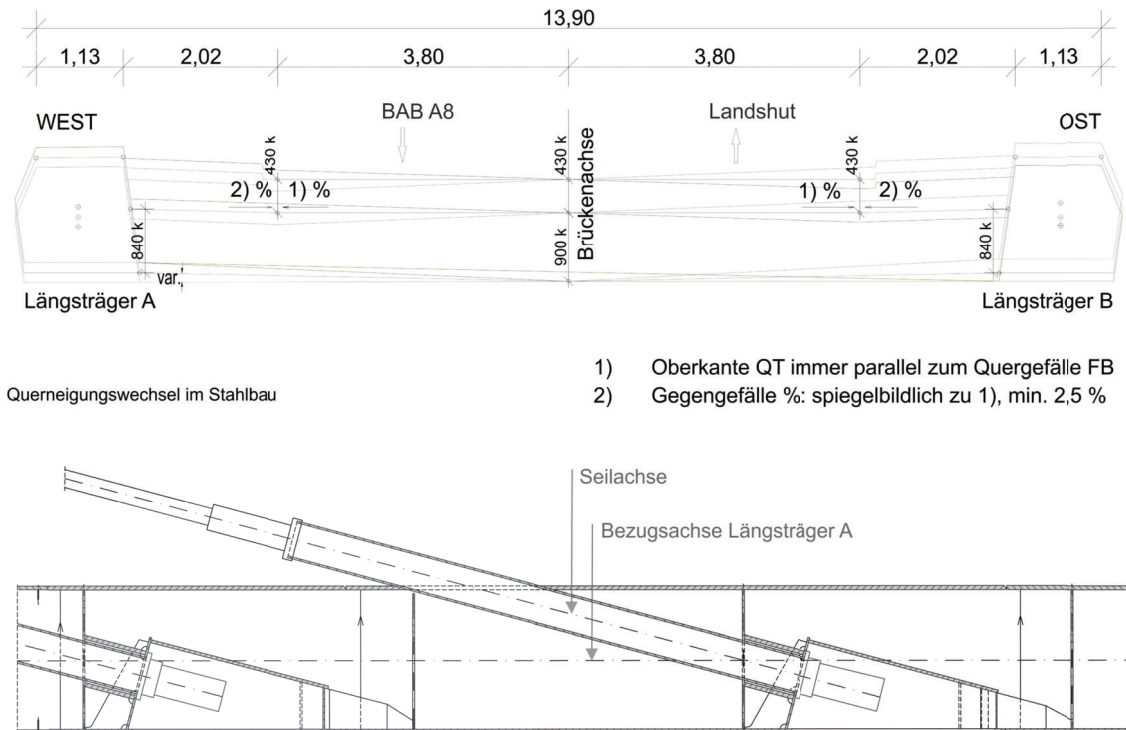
Change in Cross Slope in Steel Construction and Anchoring of the Cables Inside the Longitudinal Girders (©Ingenieurbüro Grassl GmbH)
